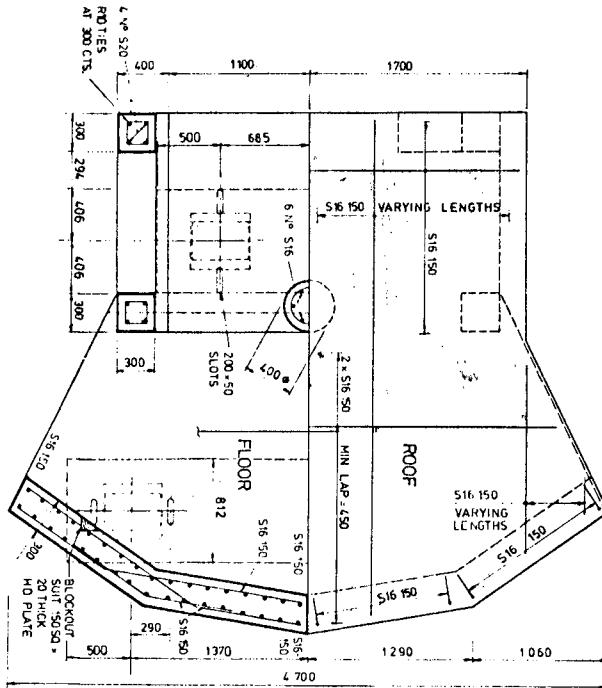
SPLIT PLAN OF OUTLET UNIT
